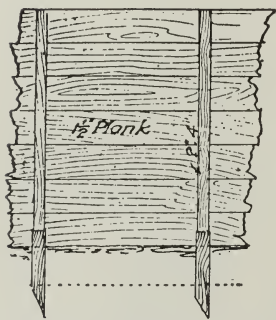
Ordinary Wood Forms for Concrete Wall. Side Elevation.
